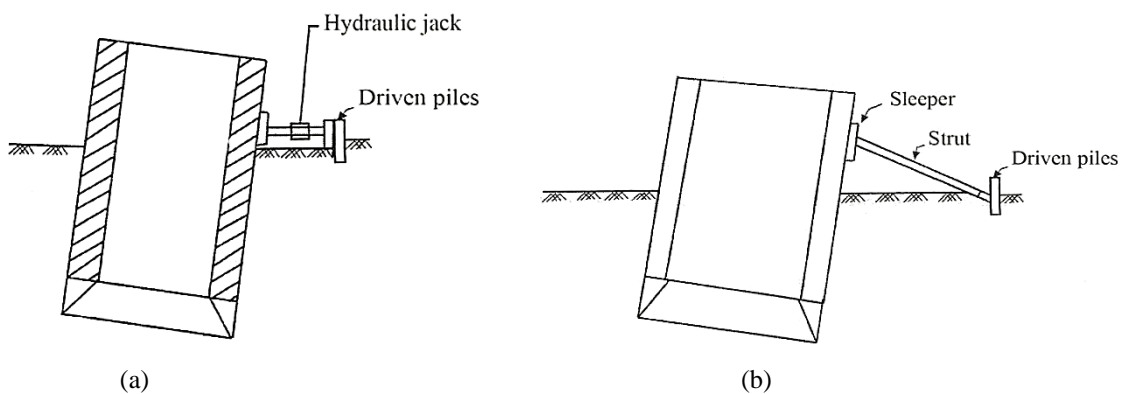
Stabilizing the structure using a) hydraulic jack and b) strutting of the wall
